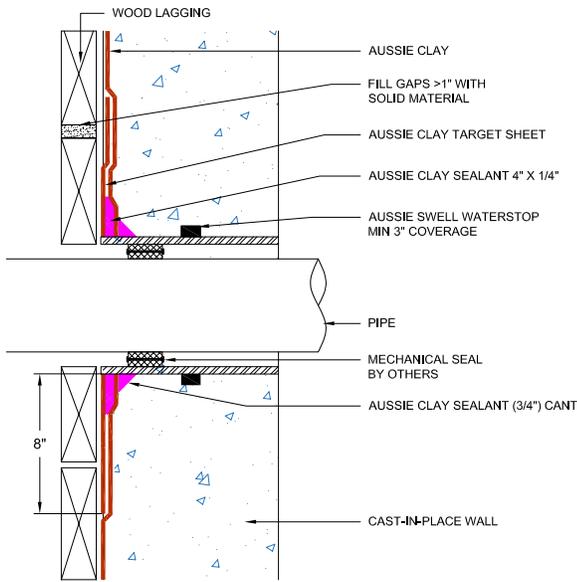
SLEEVED PIPE PENETRATION THROUGH LAGGING
